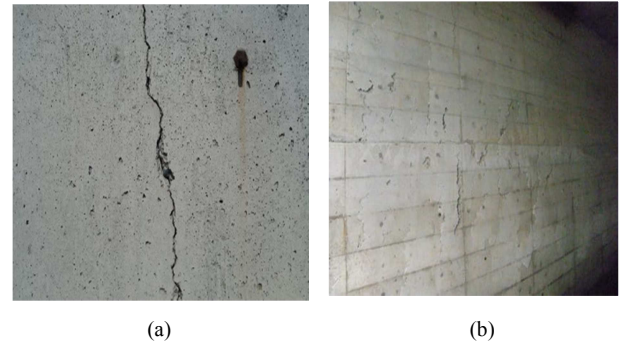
Concrete flaking occurs, cracking the concrete surface.
